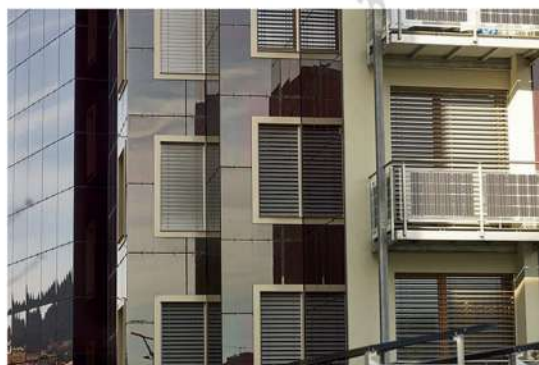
Plus Energy Building, Chiasso, CH: Re-cladding of the building envelope with a ventilated façade (cold façade) and balcony fence applications (Source: BFE-SUPSI).
